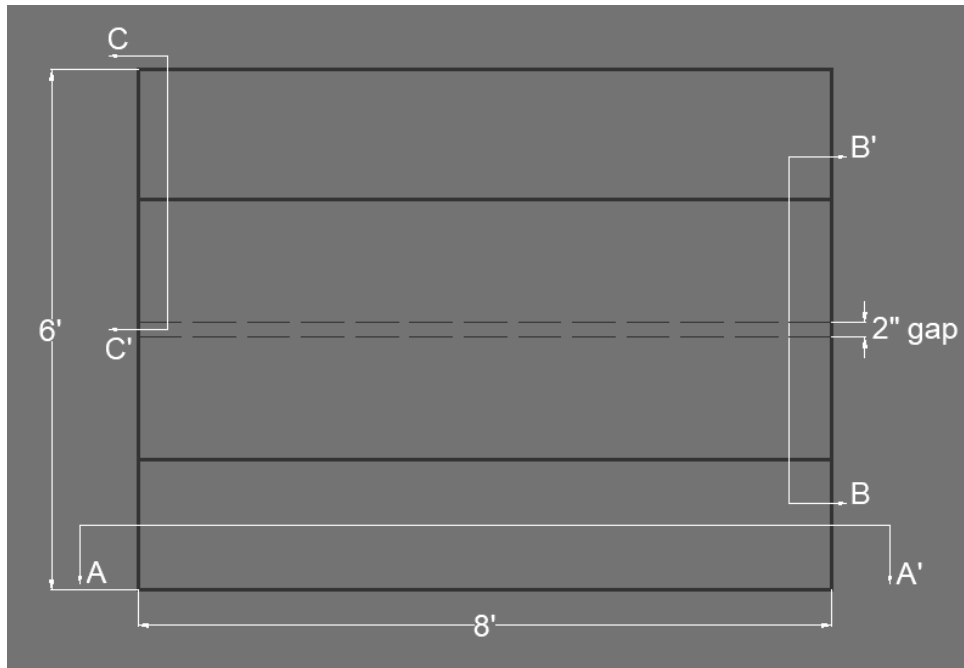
Plan view of specimen design (section marks refer to later figures)
